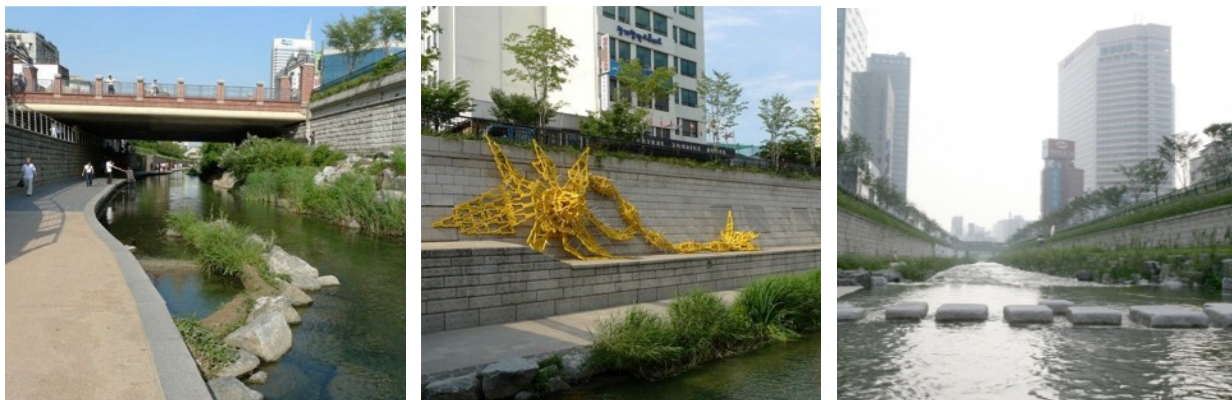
Bridge, Terraced vertical walls, and Stepping stone bridge
